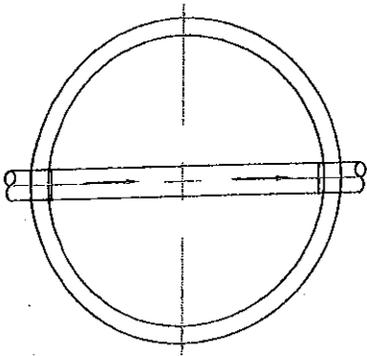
CONNECTION TO EXISTING MANHOLE
